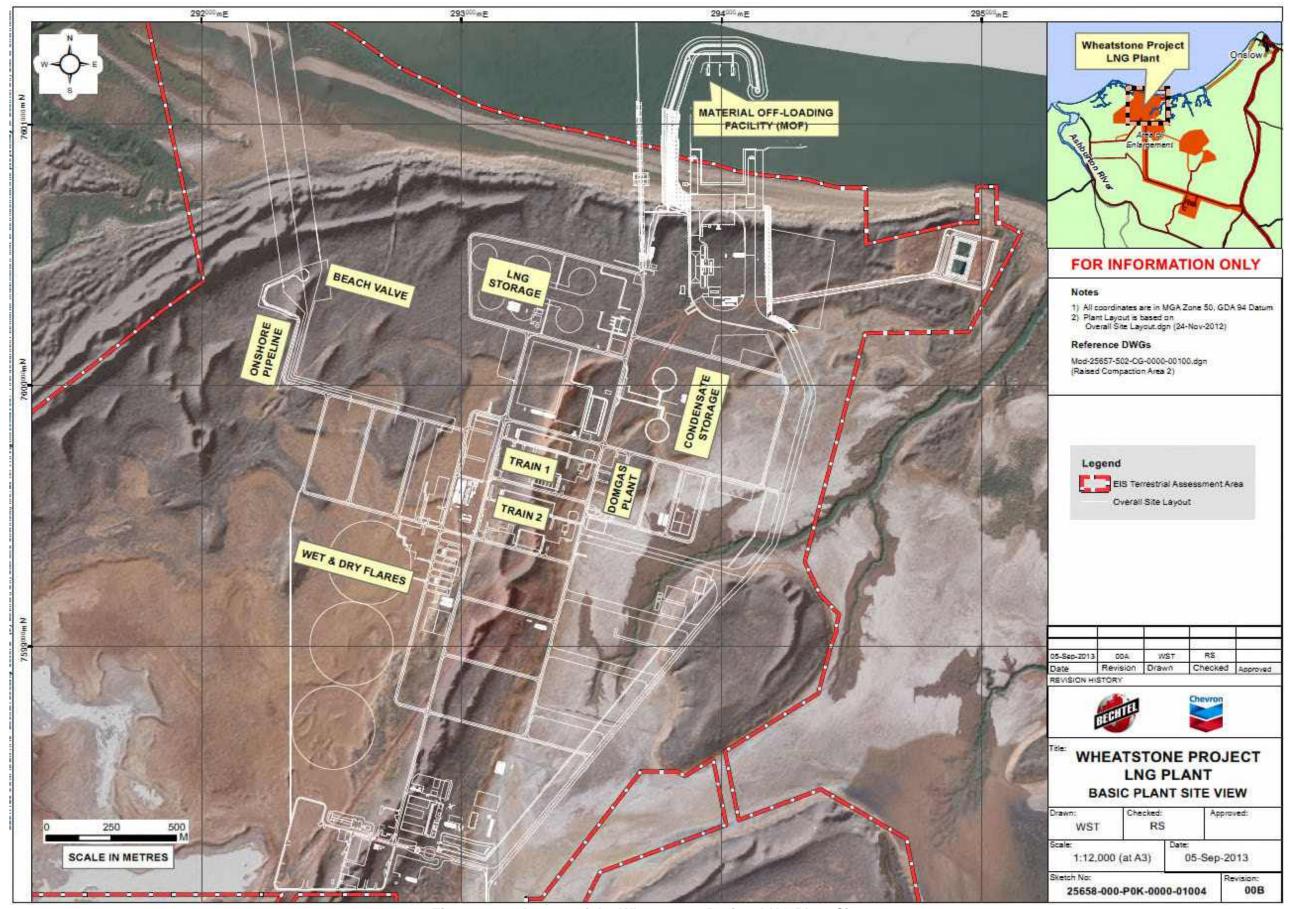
Layout of the Wheatstone Project LNG Plant Site
